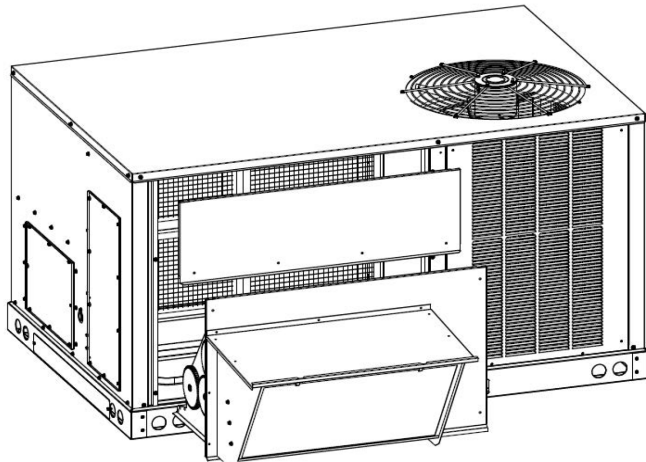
ECONOMIZER HOOD ASSEMBLY
